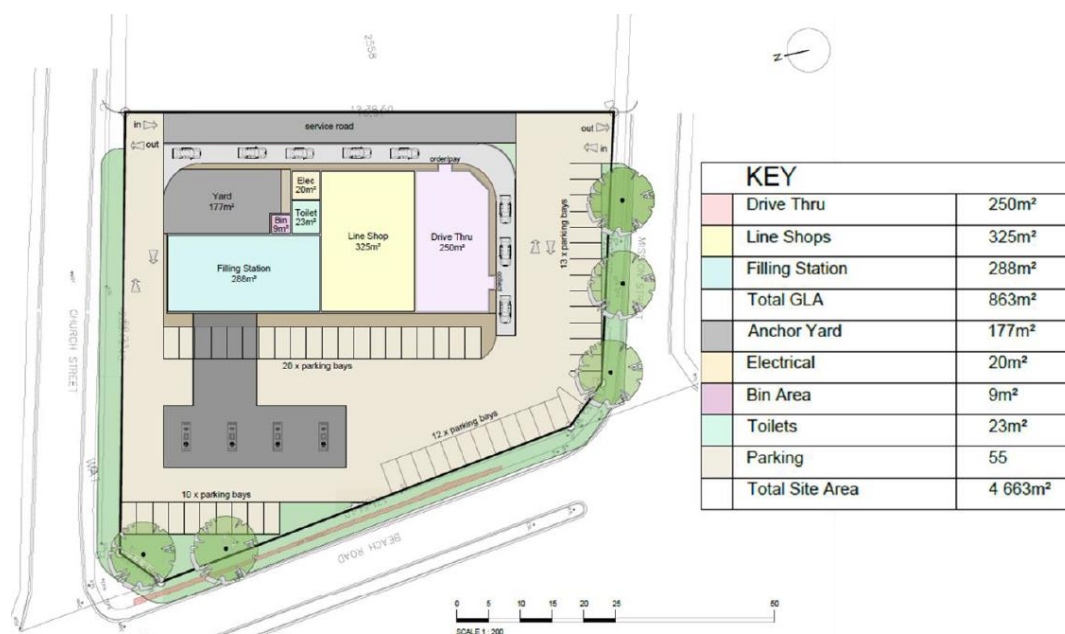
The preferred site development plan (SDP) for Erf 7379 in George.
